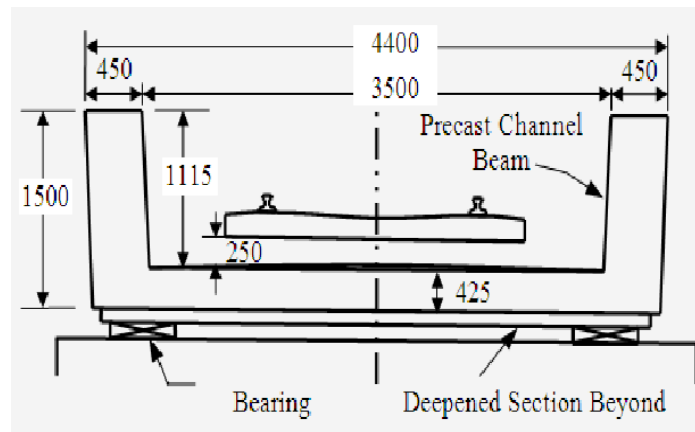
Cross – section for Wodonga Rail Bypass in Austria
